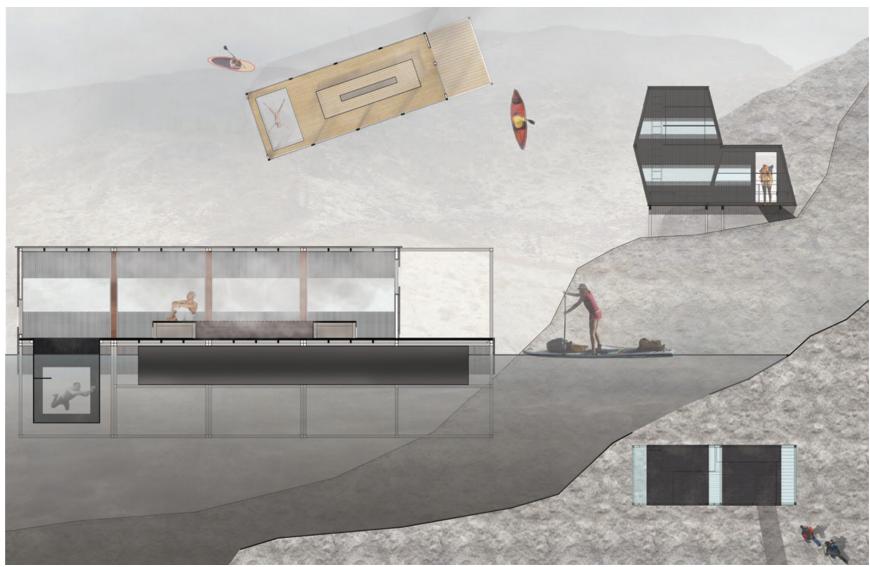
Section, Plan, and Elevation of shelter and floating sauna.
